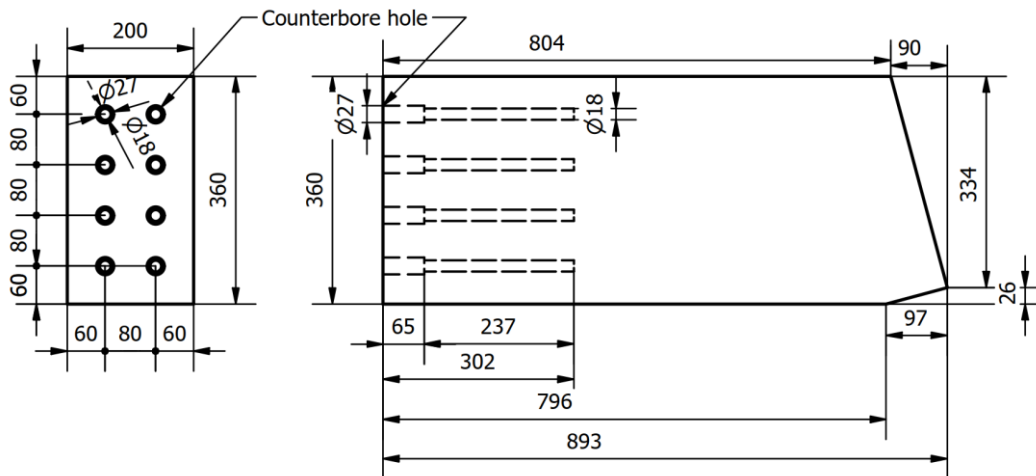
Glulam beam dimensions in mm (left: end cross-section; right: side view with displayed counterbore holes).
